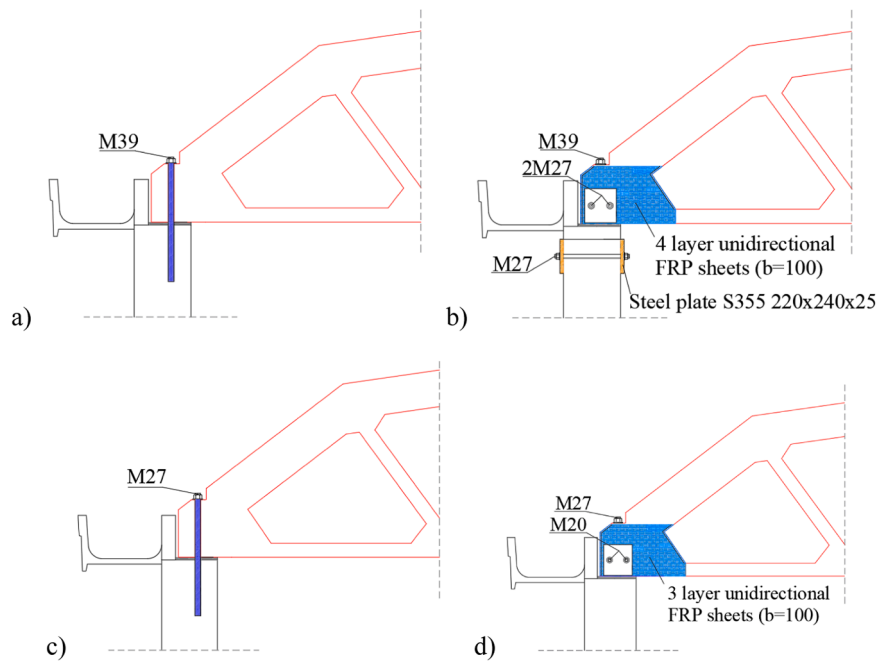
Building EE3 – design of beam-to-column connections: (a,b) corner columns, (c,d) lateral columns. Note: The reported dimensions are in mm; 10.9 grade dowels were adopted.
